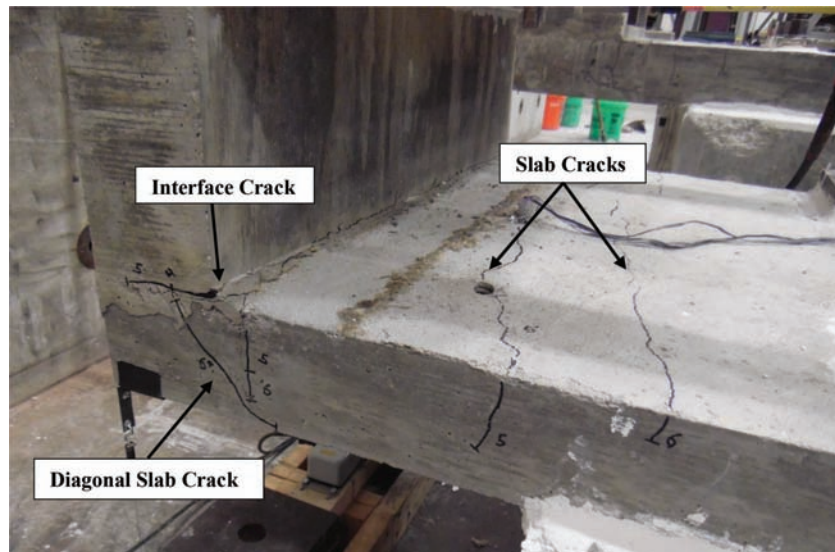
Strip Specimen 7 cracking at 6.4 kip.
